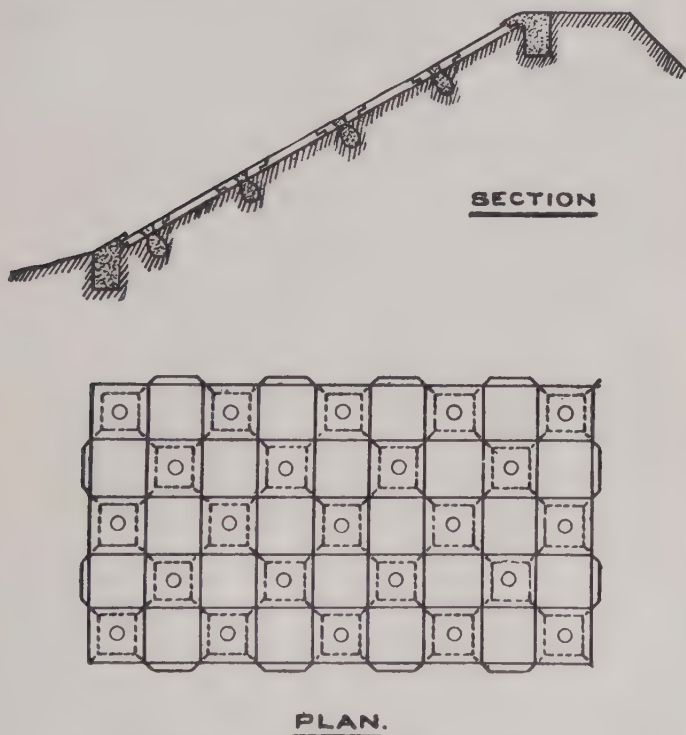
De Muralt Concrete Plating of Embankments (Light Type)
